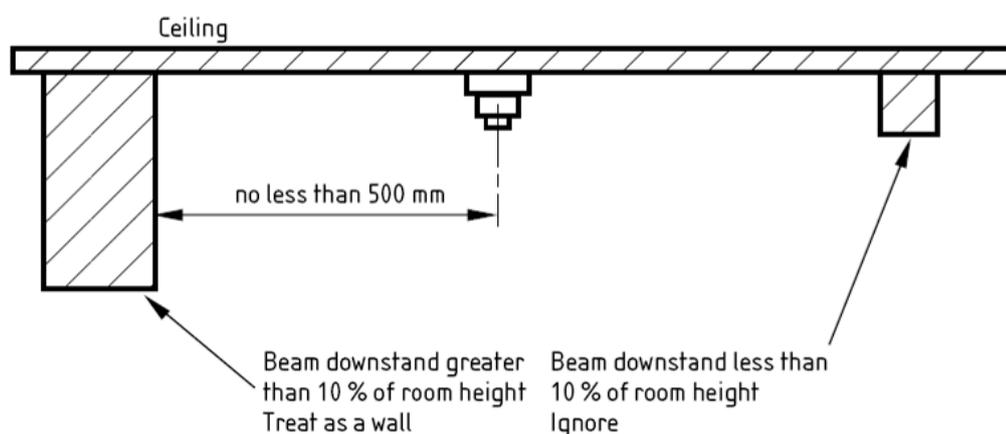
Ceiling obstructions treated as walls /14, p.55/
